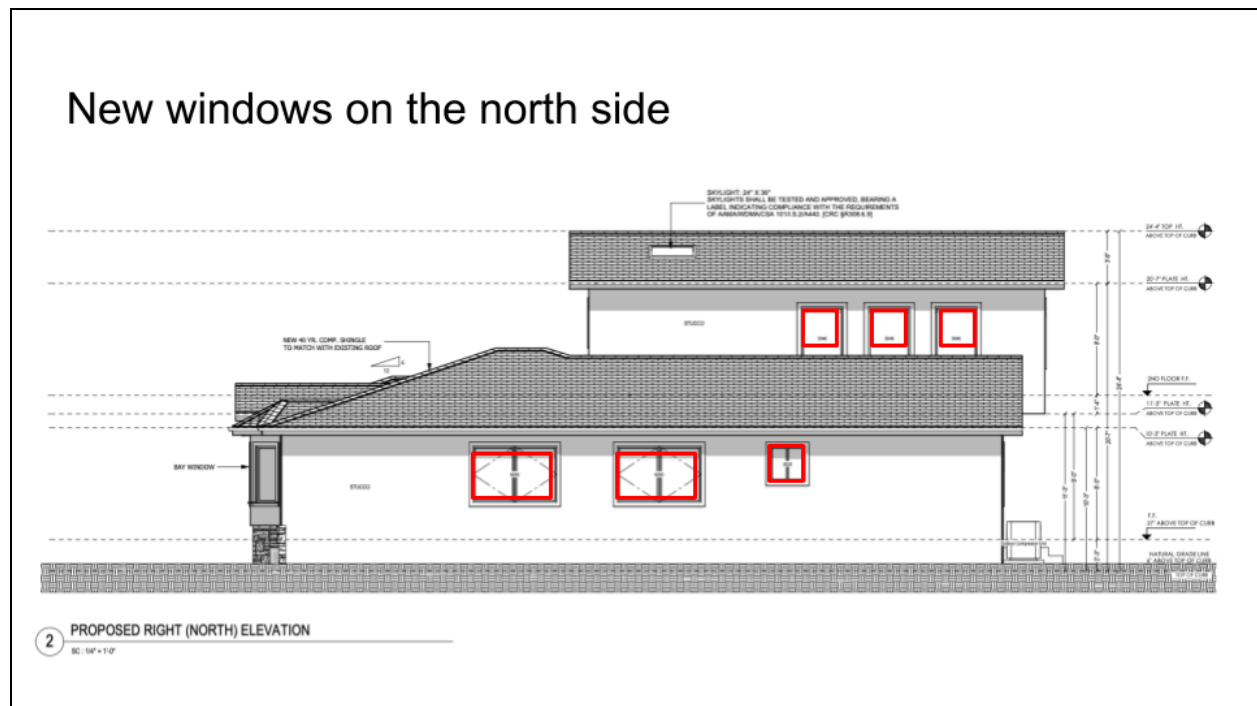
Planned 6 windows of 1585 Mallard Way facing our property
